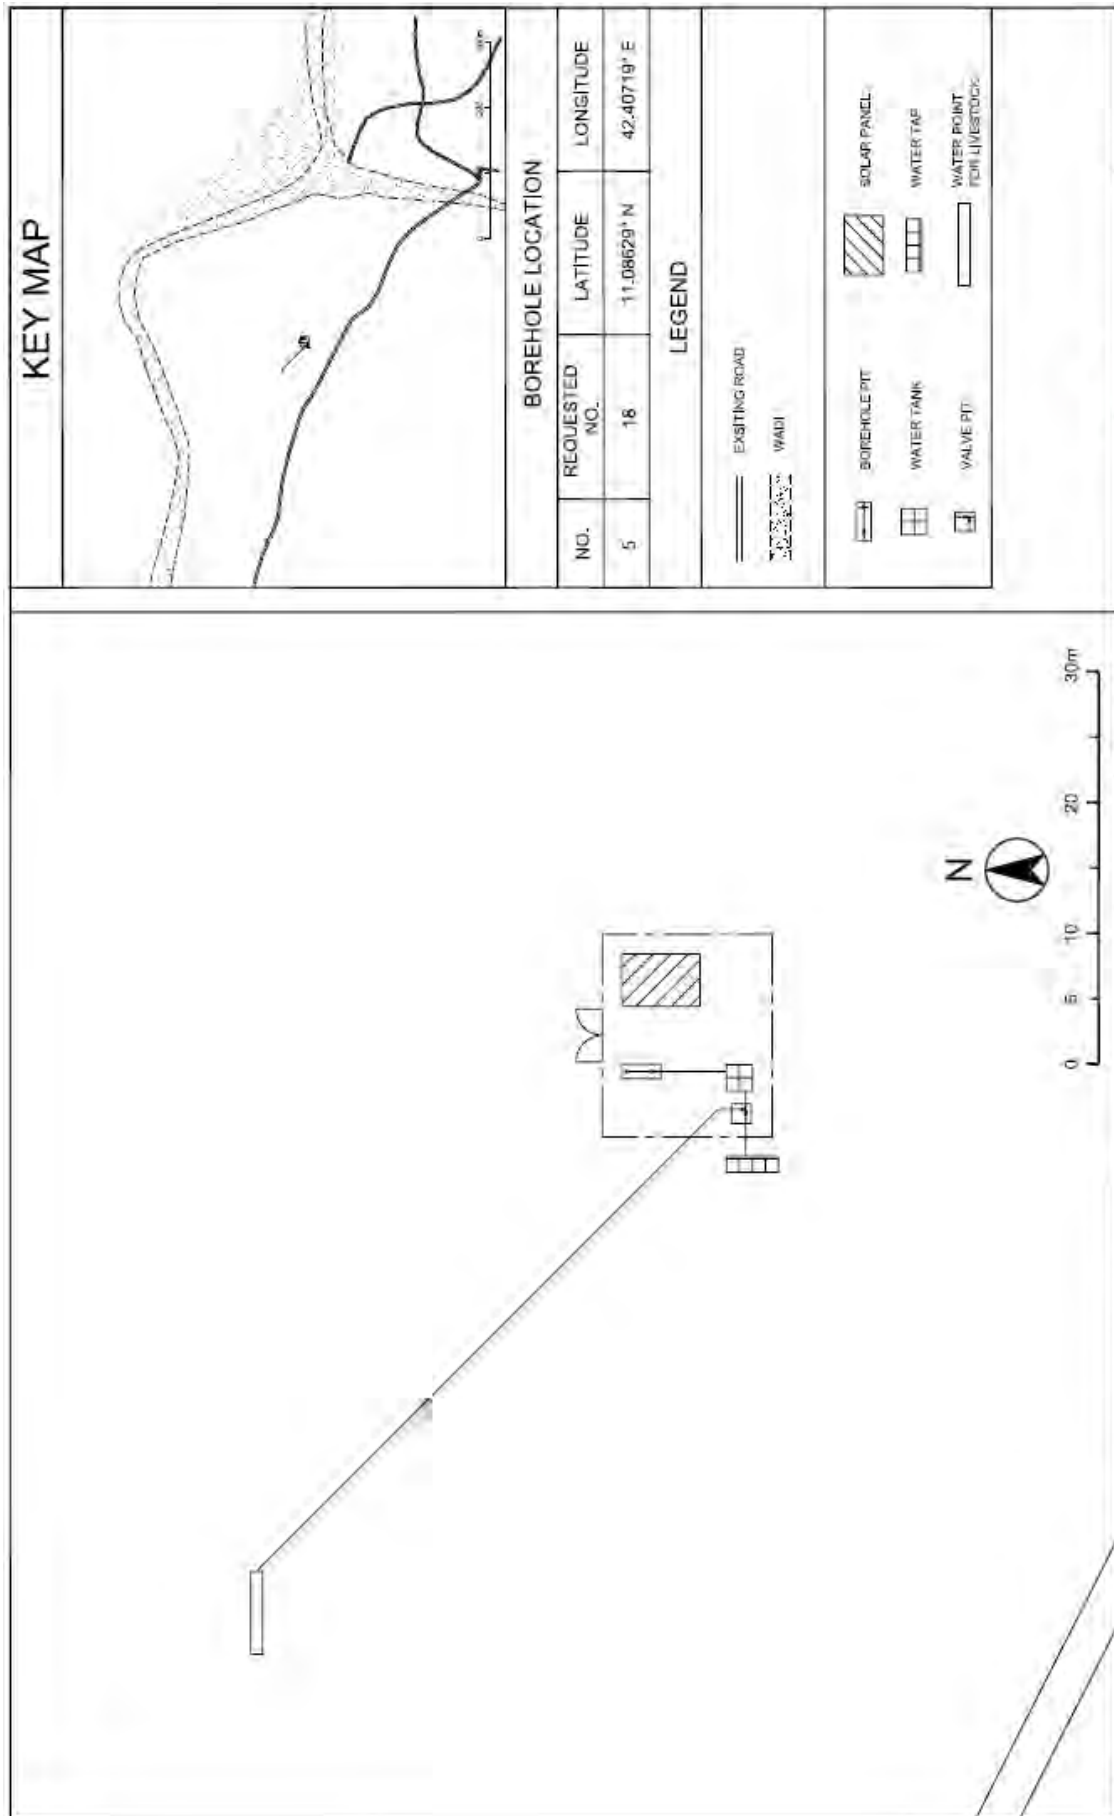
Layout of Facility (7) [Afka Arraba]
